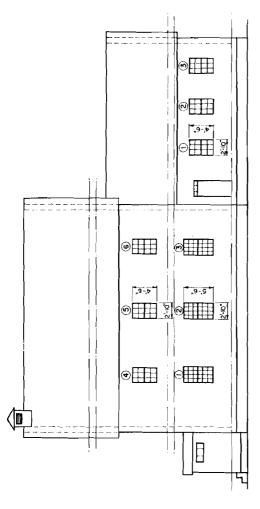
BUILDING No. 8 - TWO - STOREY SOLID BRICK SCHOOL WITH ONE - STOREY EXTENSION AT REAR
